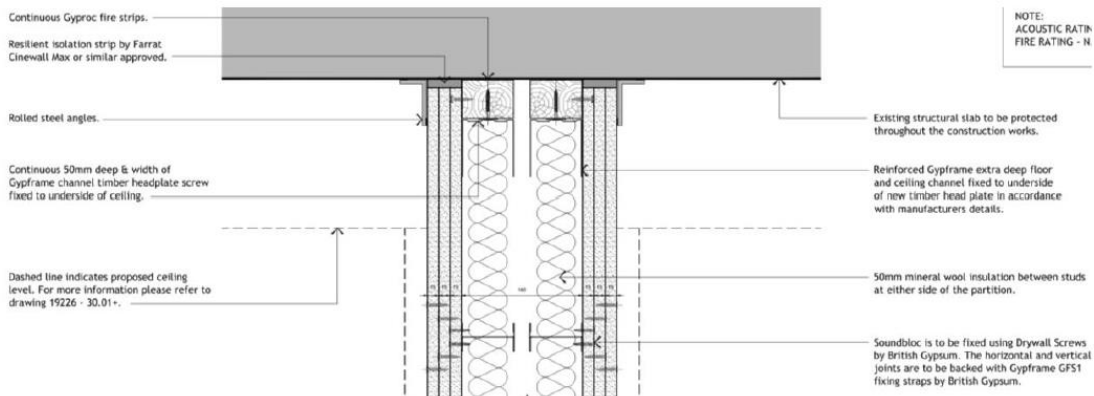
Proposed head detail for karaoke room wall cross walls (Wall type 1)
